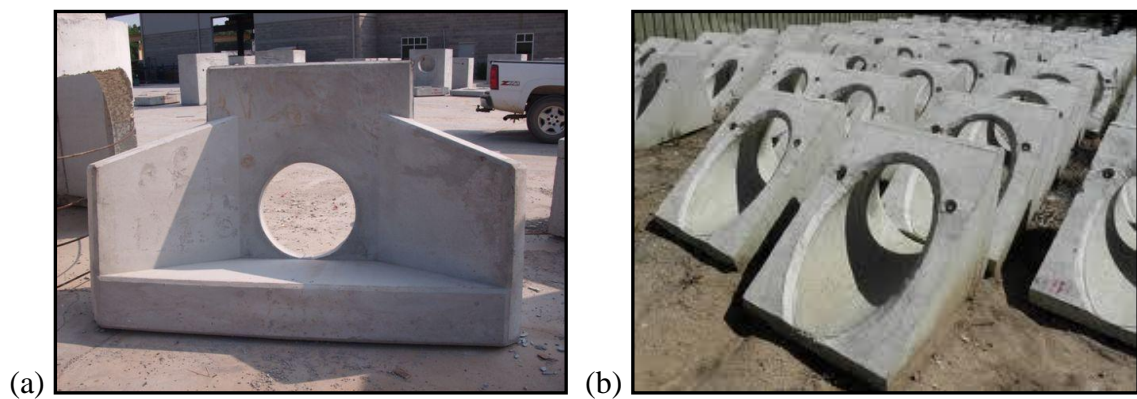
Prefabricated culvert inlets (a) vertical head wall (b) mitred to match fill slope
